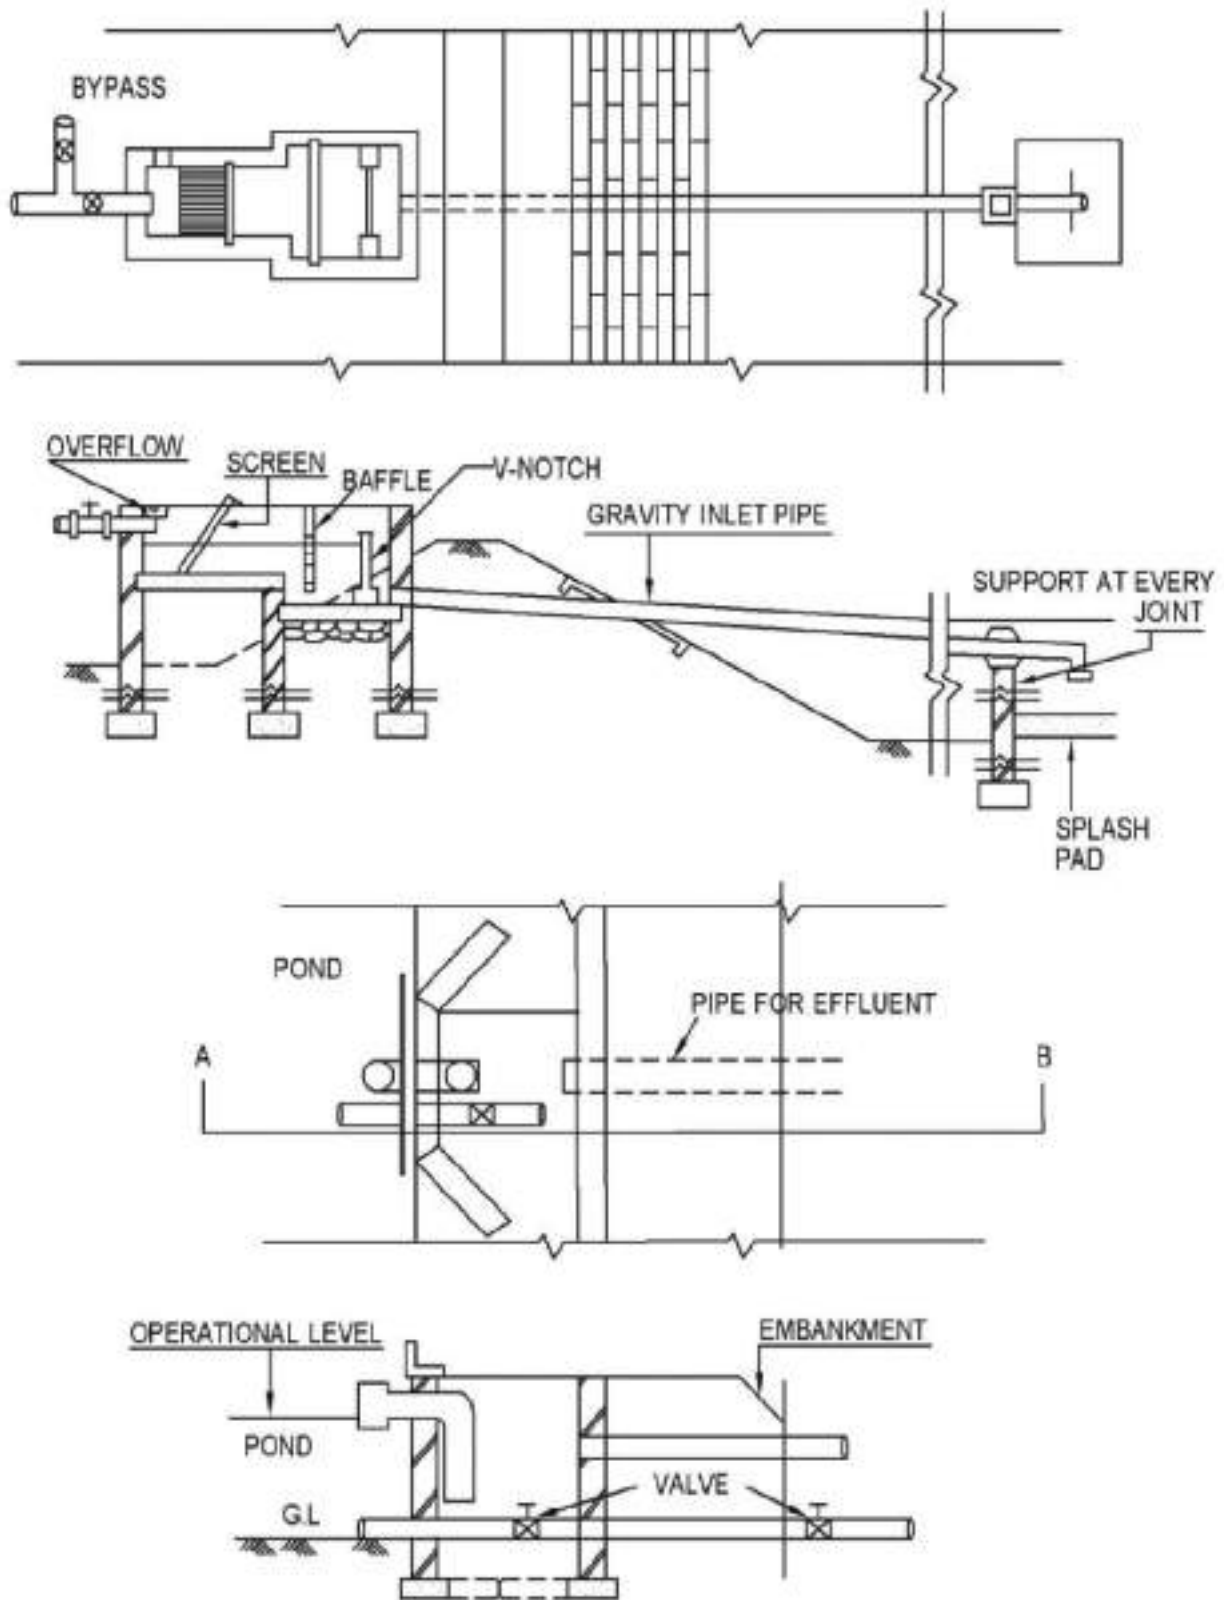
Typical details of inlet and outlet chamber for facultative waste stabilization pond
